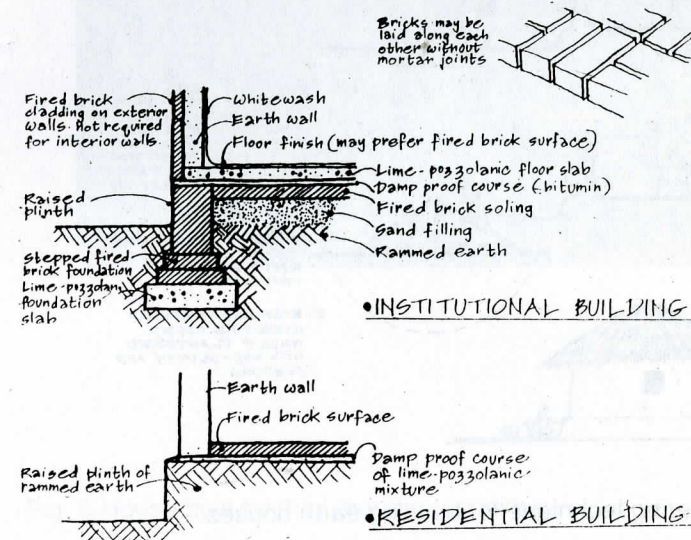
Some proposed methods of damp-proofing floors of earth building.
